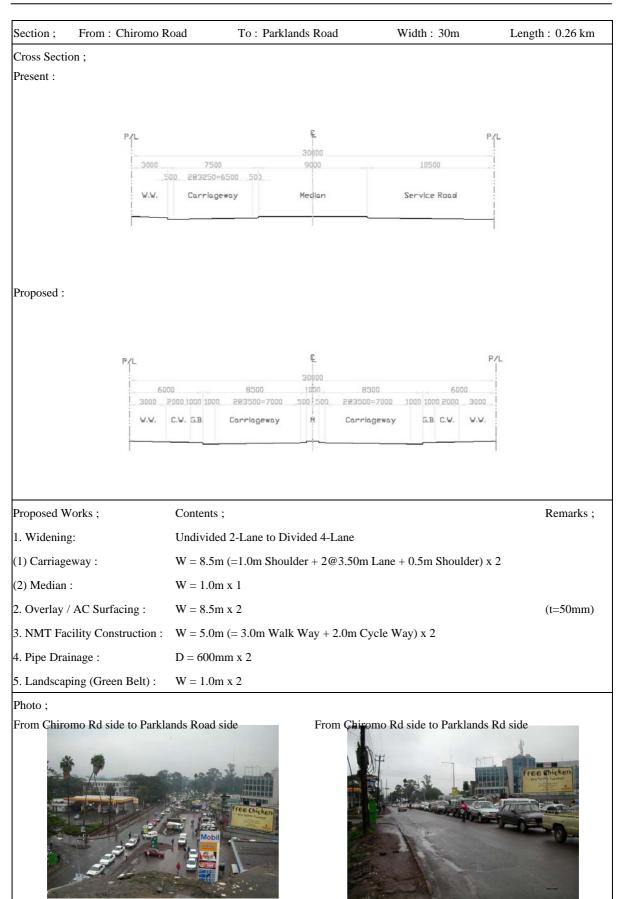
IMPROVEMENT OF RING ROAD WESTLANDS-1
